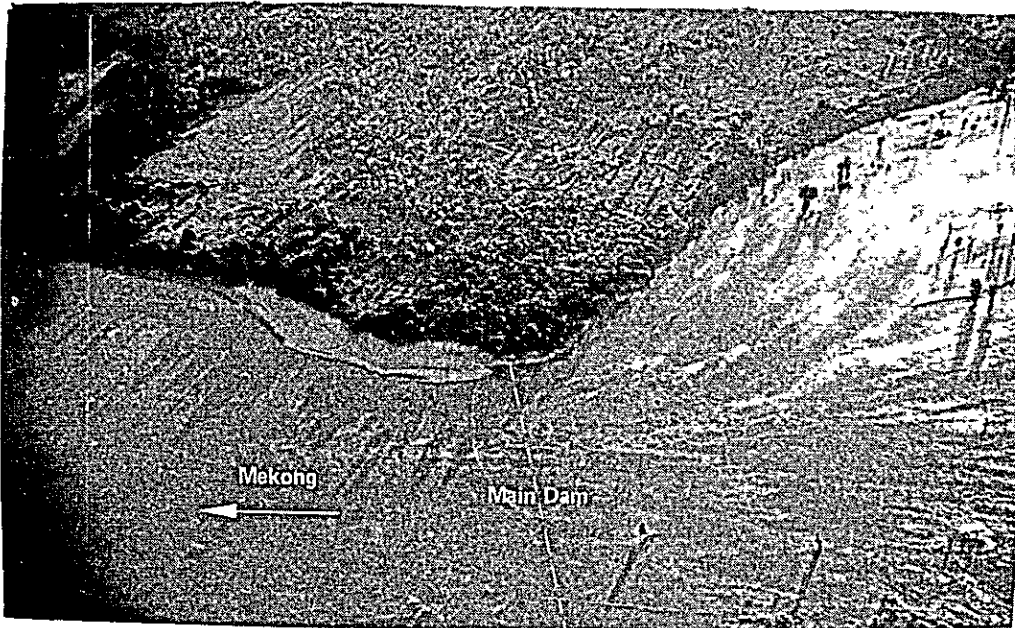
Right Bank of Samhor Dam Site (December 1964)
